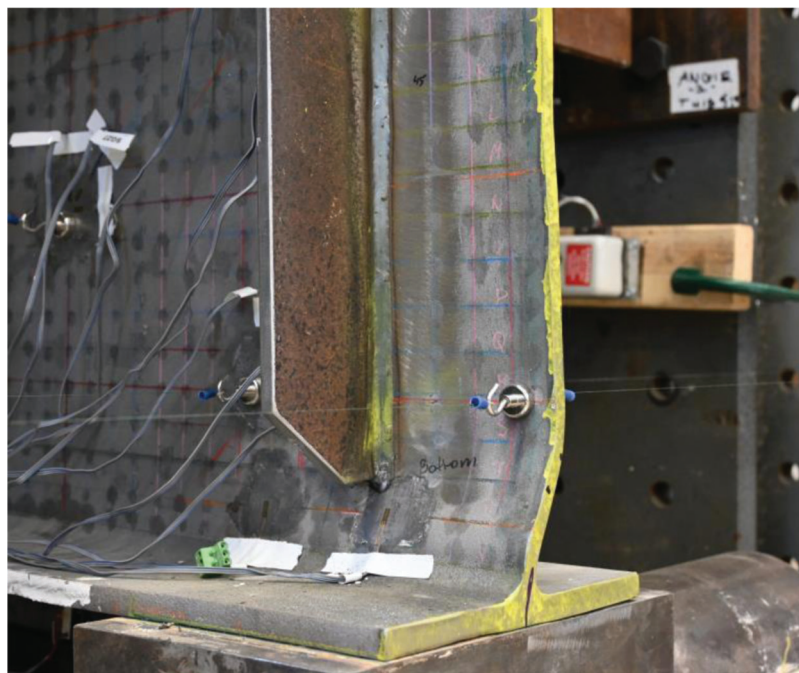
Specimen 1: deformed shape, view from the east side.
